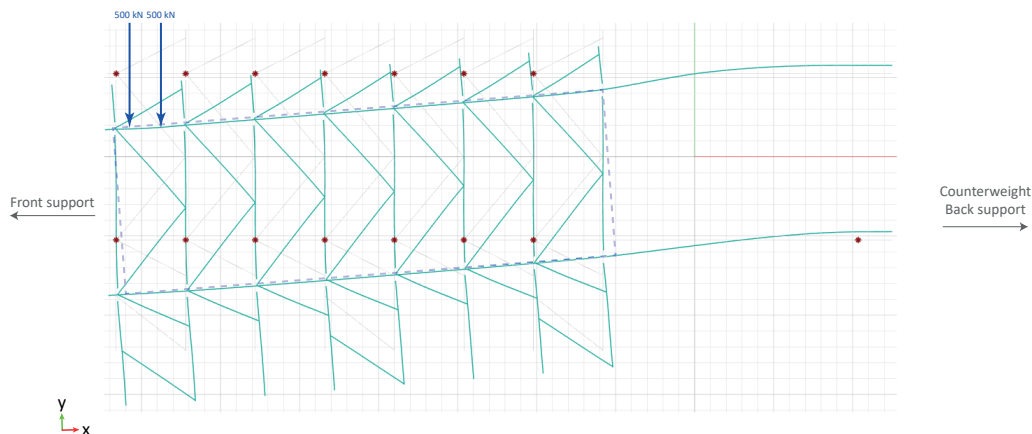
Lower bound response to a static collision force, showing the deformed main girders, cross girders and bracing elements
